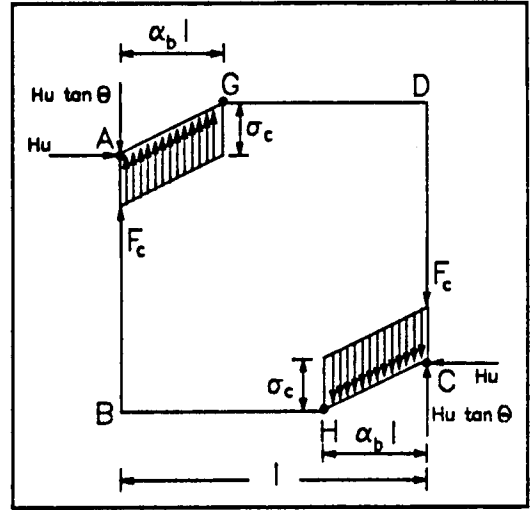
Mode (b) corner crushing with failure in beams (after Liauw and Kwan, 1983).
